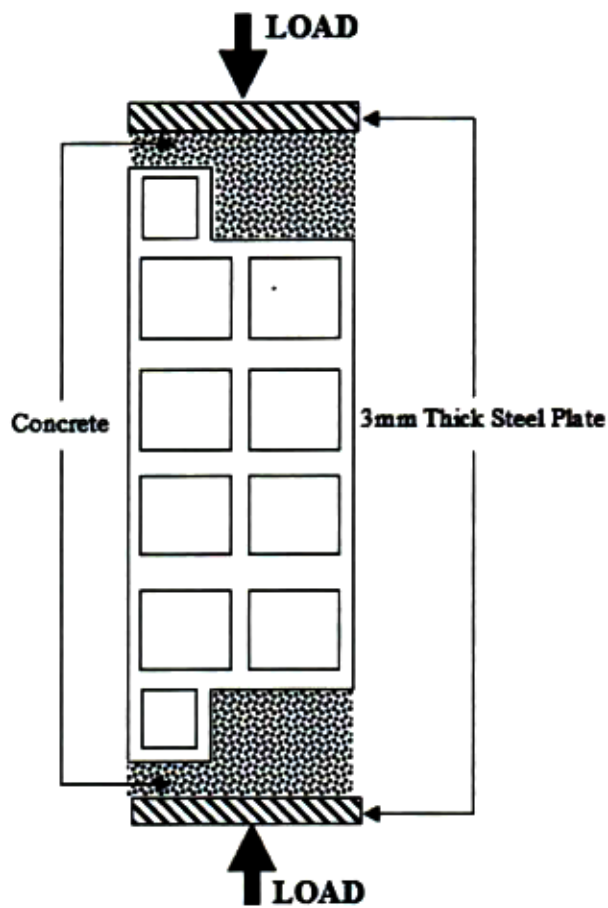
Loading arrangement of burnt clay hollow blocks loaded perpendicular to the holes
